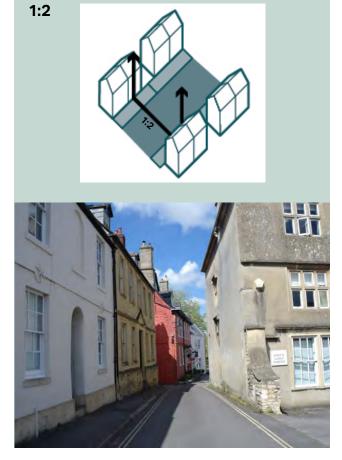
Local example of 1:2 enclosure, which is created by a narrow road in Calne Town's medieval core bordered by houses on both sides of the road and narrow pavements.
